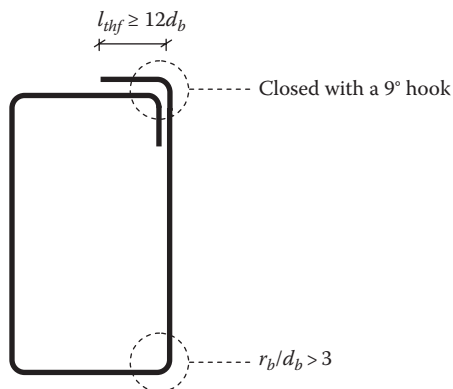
Selected stirrup detailing requirements from ACI 440.1. (From ACI, *Guide for the Design and Construction of Concrete Reinforced with FRP Bars*, ACI 440.1R-06, American Concrete Institute, Farmington Hills, MI, 2006.)
